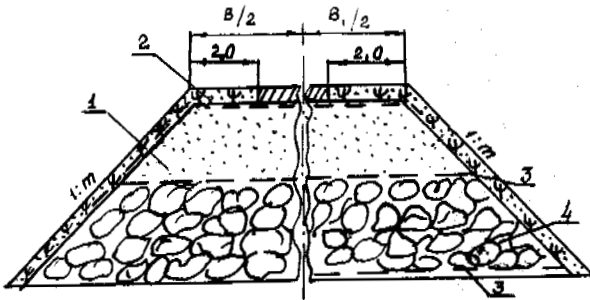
Structure of the embankment with geotextile interlayers and envelopes: 1- sand; 2- pavement slabs; 3- geotextile envelope; 4- frozen lumpy soil
